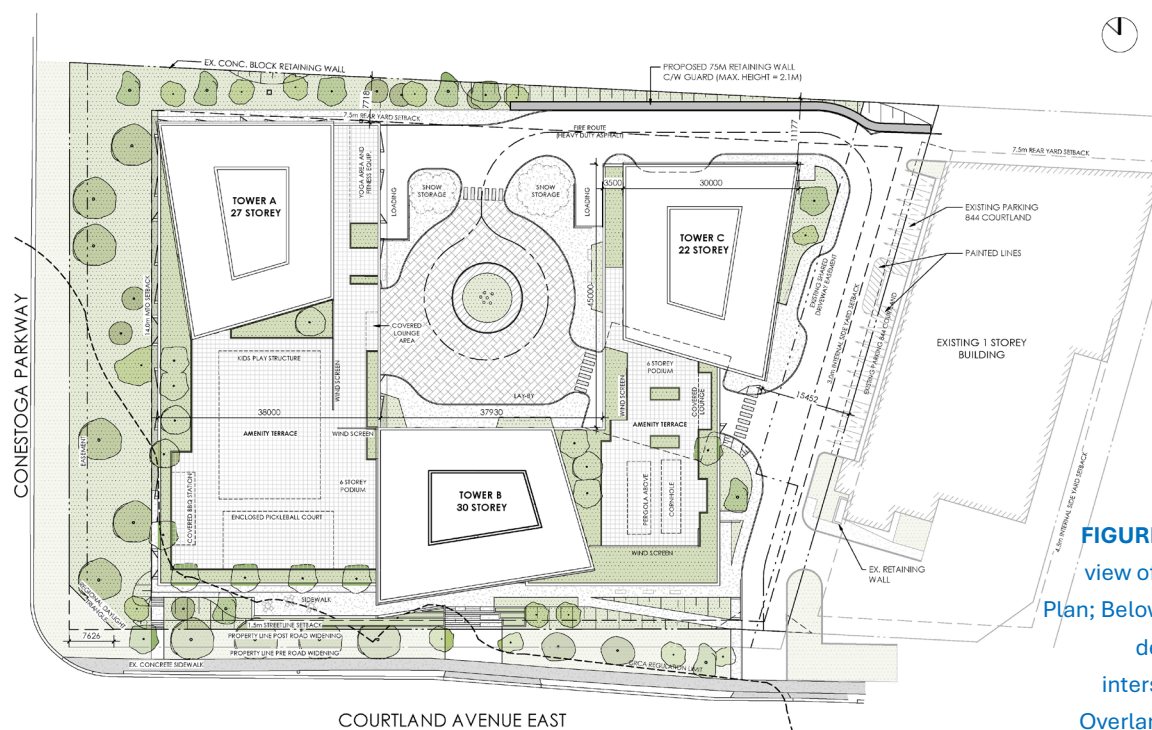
FIGURE: Proposed Development Plan for 808 & 836 Courtland Avenue East (ABA Architects)
